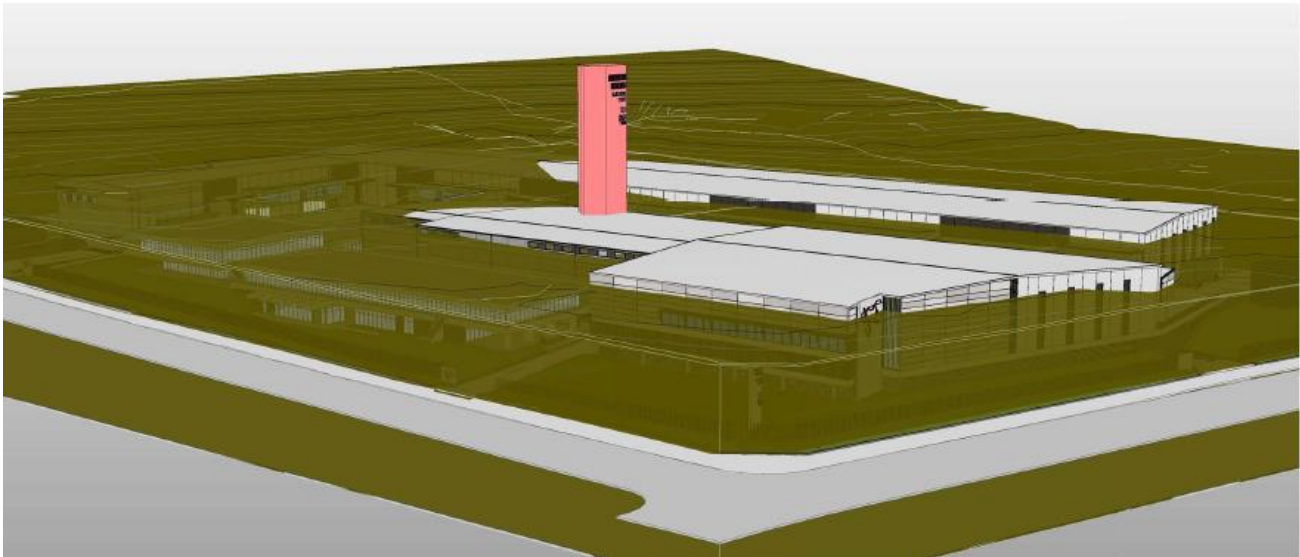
Areas of Building Height non-compliance are shown in white, with pink showing existing Roche tower to be retained (Source: SBA Architects, 2019)
